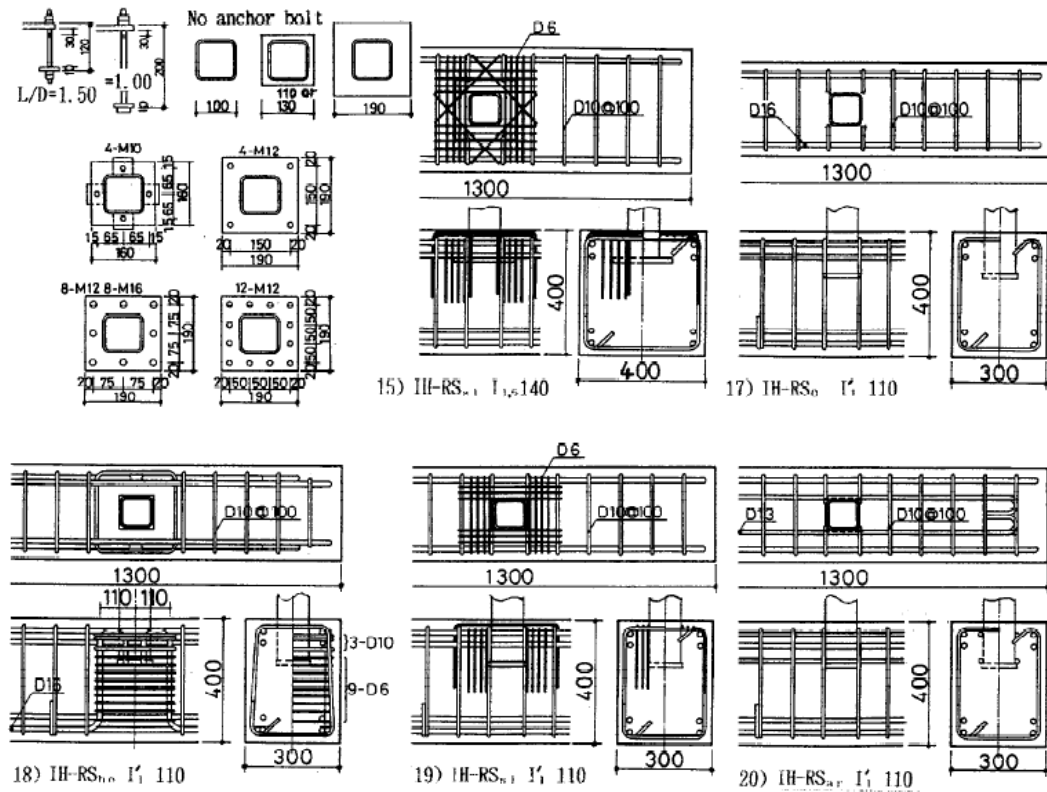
Details of anchor bolts, baseplates and reinforcements for steel column bases
